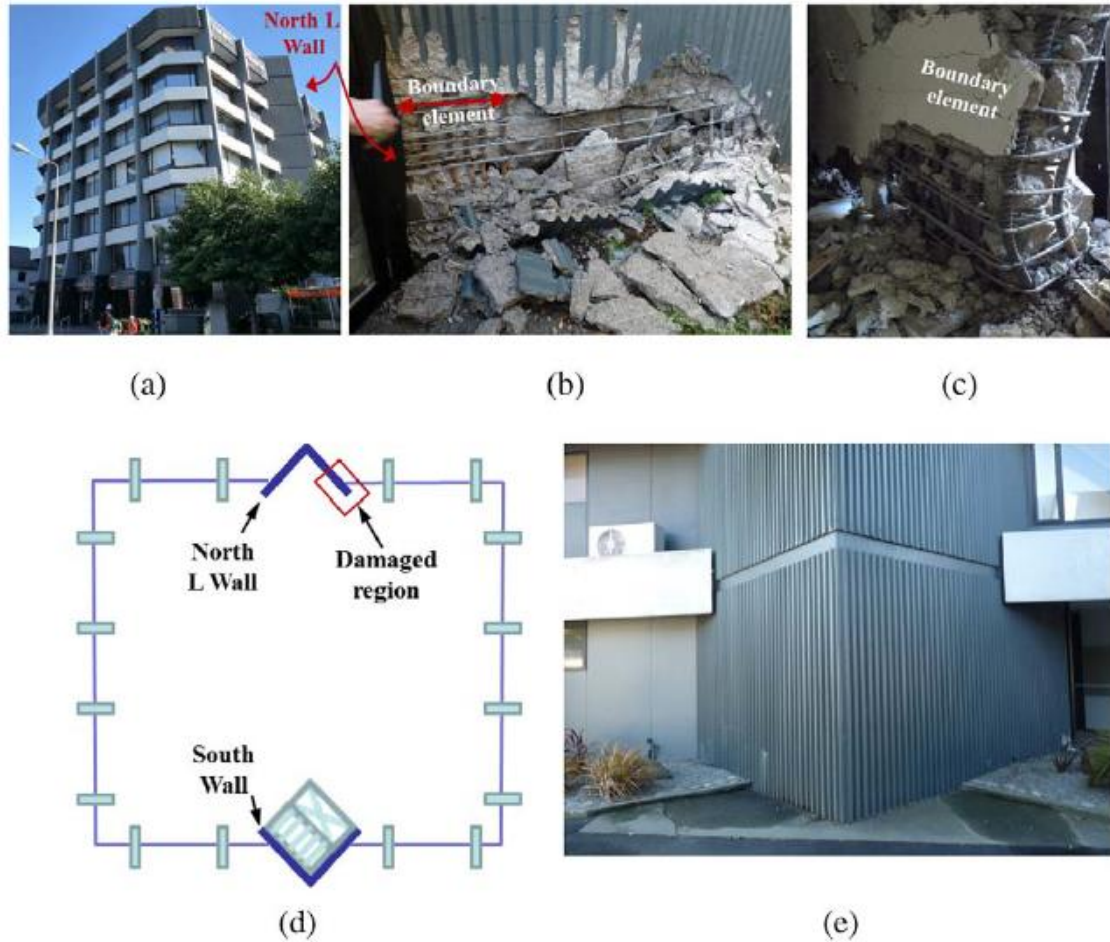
A seven-story office building with wall damage. (a) Overall view; (b) damaged north L wall; (c) close-up of buckled region; (d) plan view (after Elwood 2011); (e) undamaged south L wall. (Sritharan *et al.*, 2014) (Credit: Elwood)
